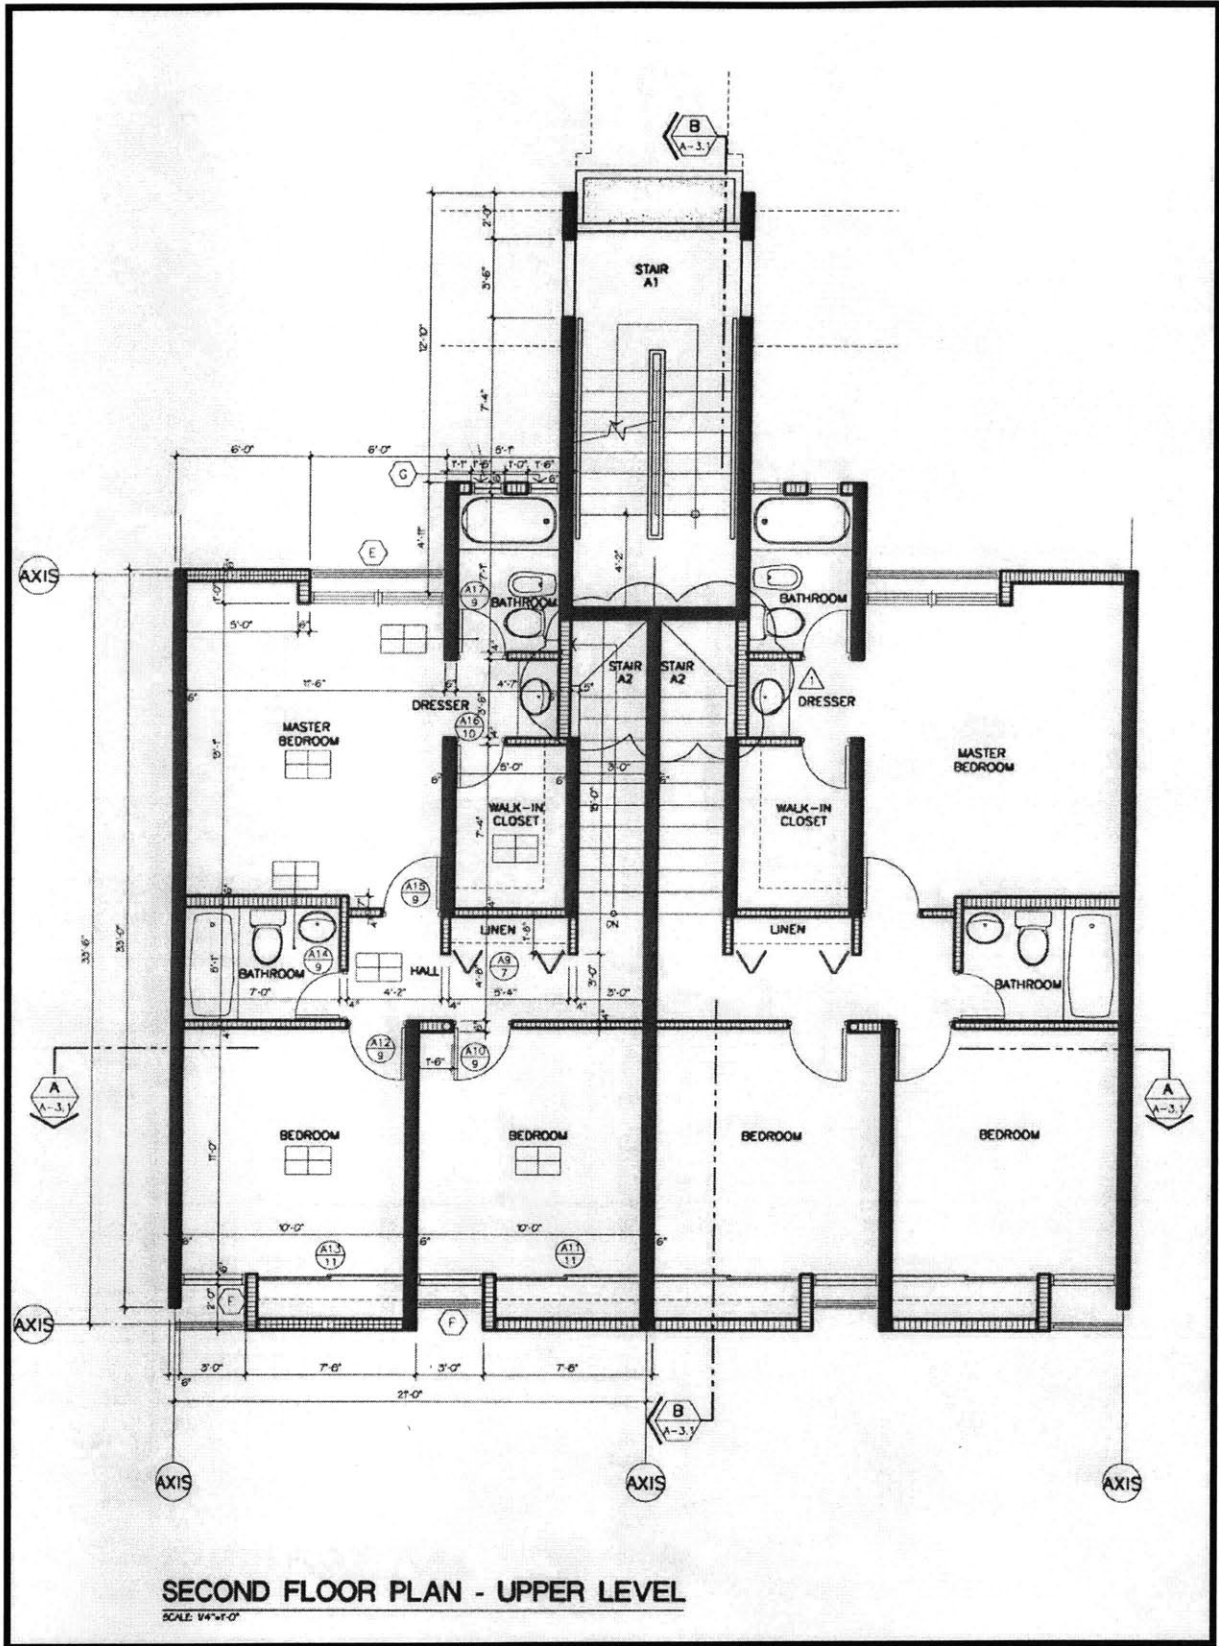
Second floor of walk-up unit. (Used with permission: Sierra, Cardona, Ferrer)
